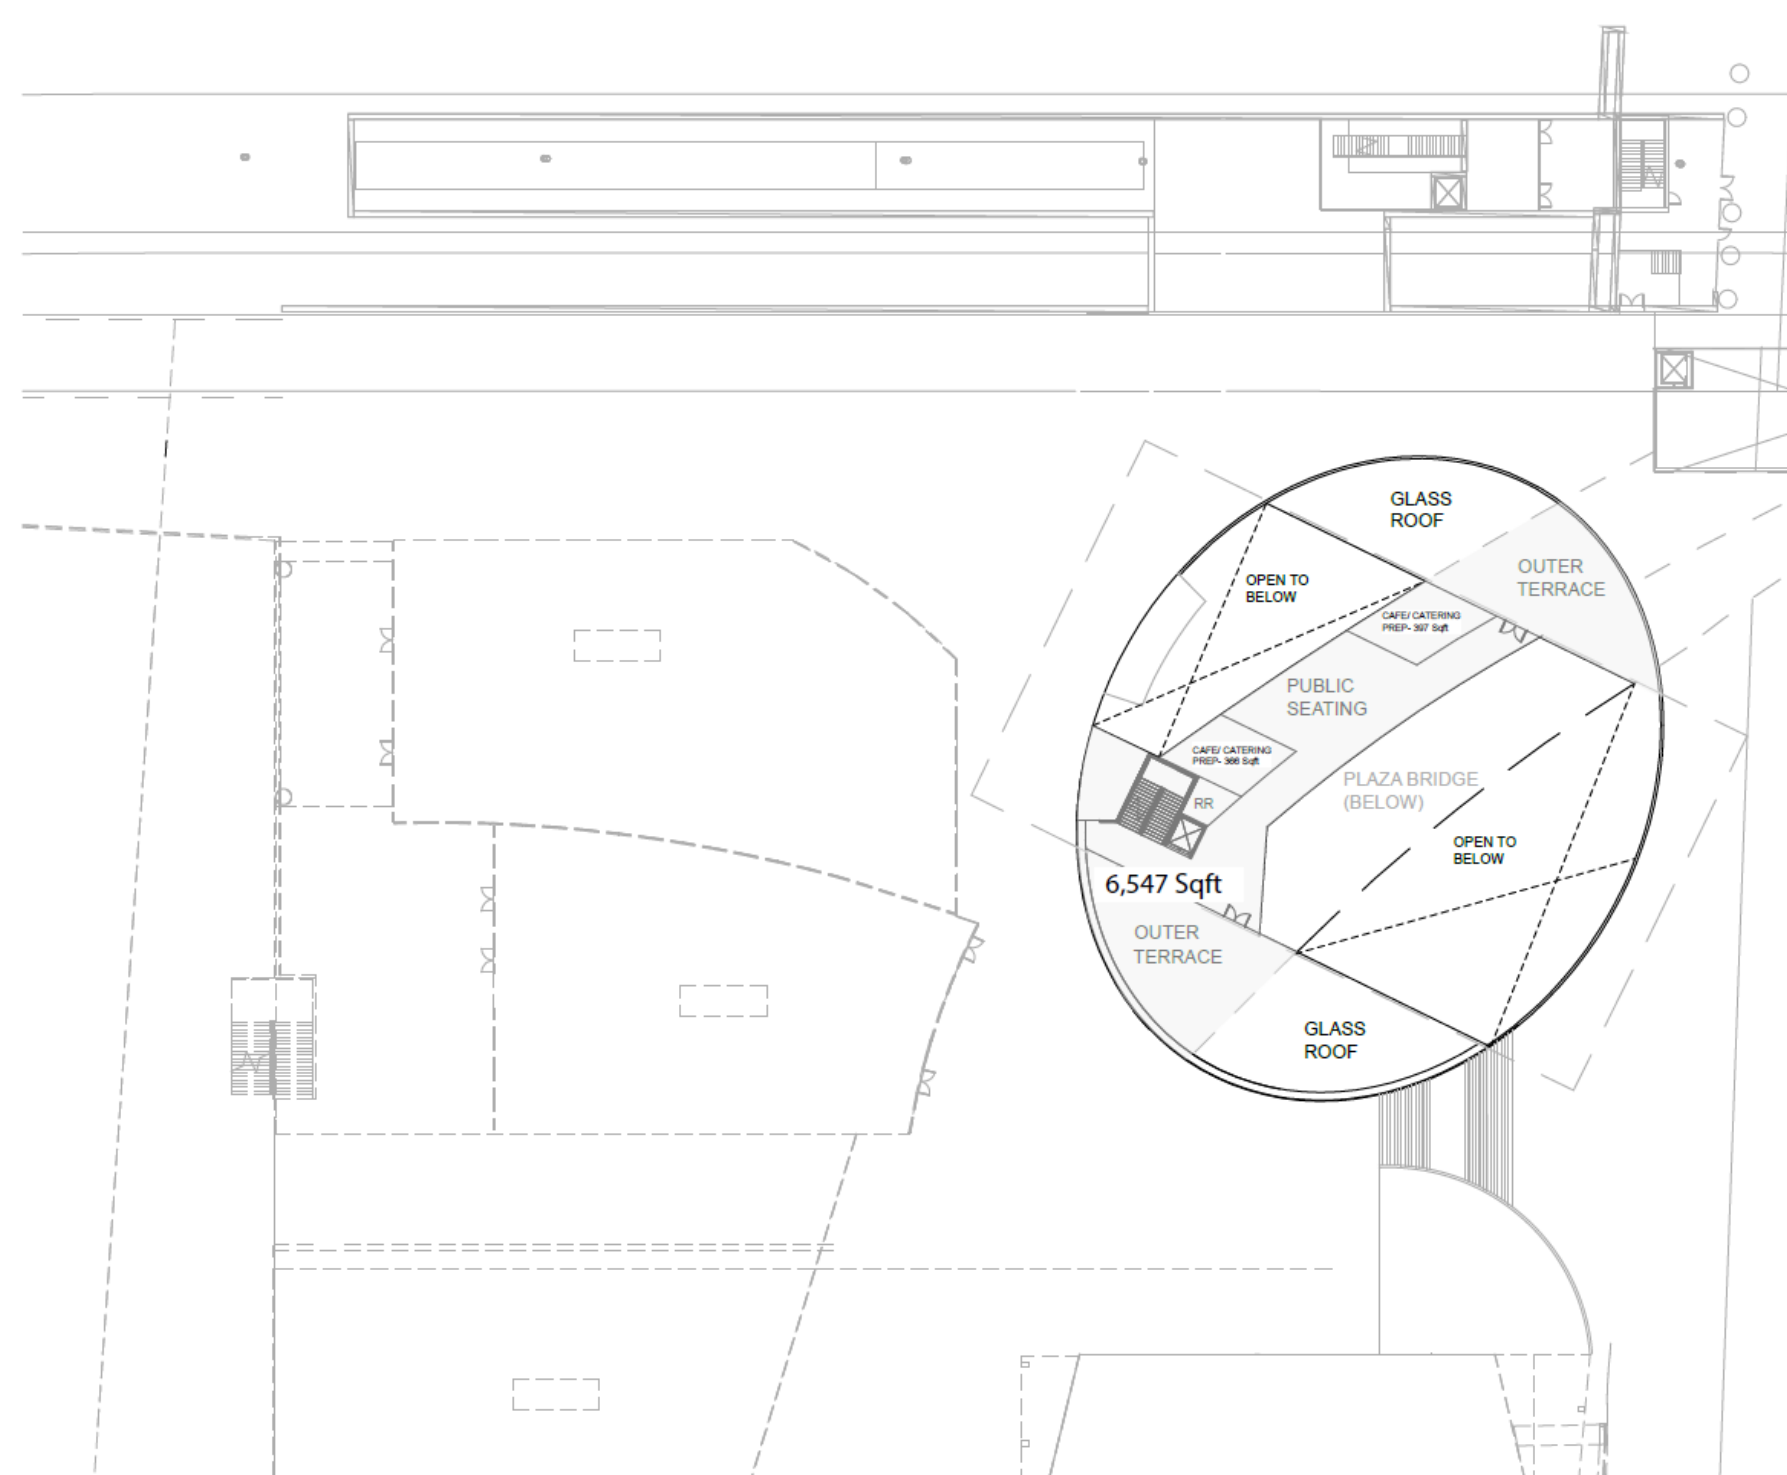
Rail Station Conceptual Floor Plan (Plaza Level)
